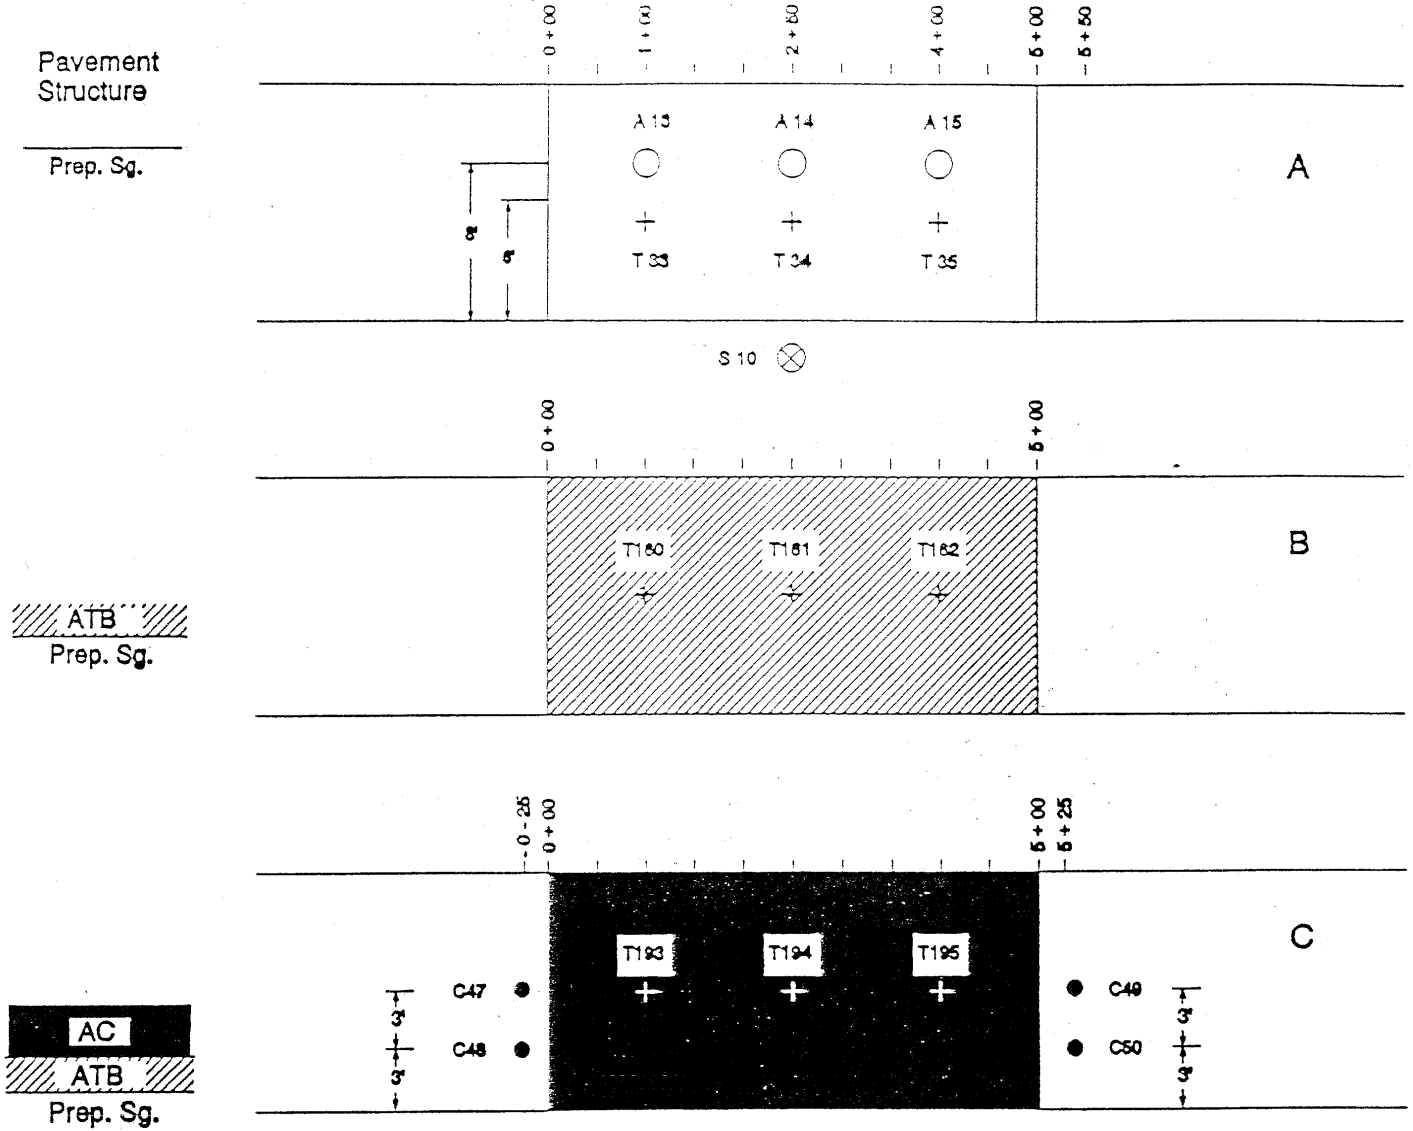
Sampling and Testing Plan for Test Sections 7 and 19
